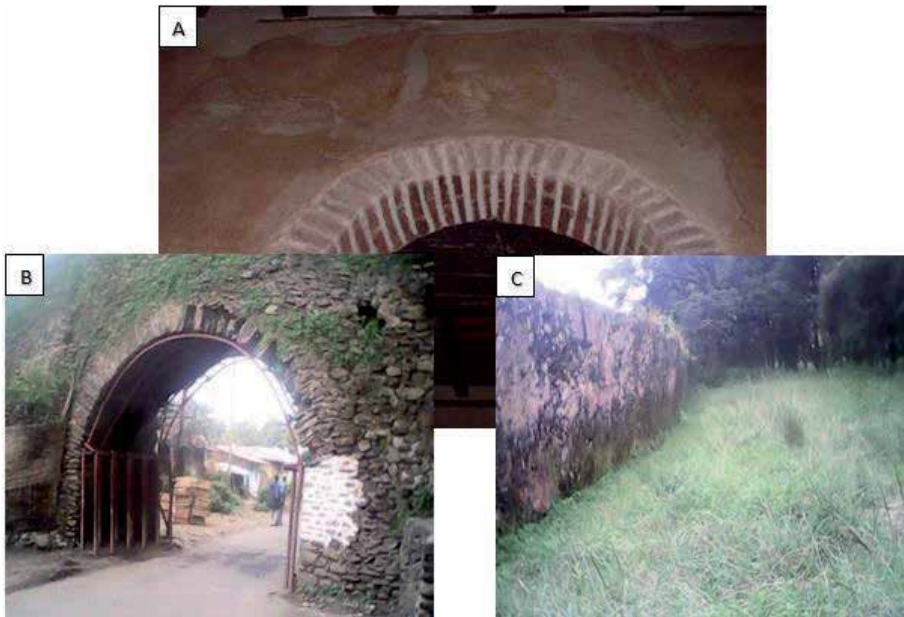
Active durability issues risking the palace: (a) crack formation inside the palace internal partition wall (repointed surface), (b) steel frame support aimed for the enhancement of stone masonry dome structure, and (c) tilting of the stone masonry wall inside the main palace yard [source; Eskinder Desta].
